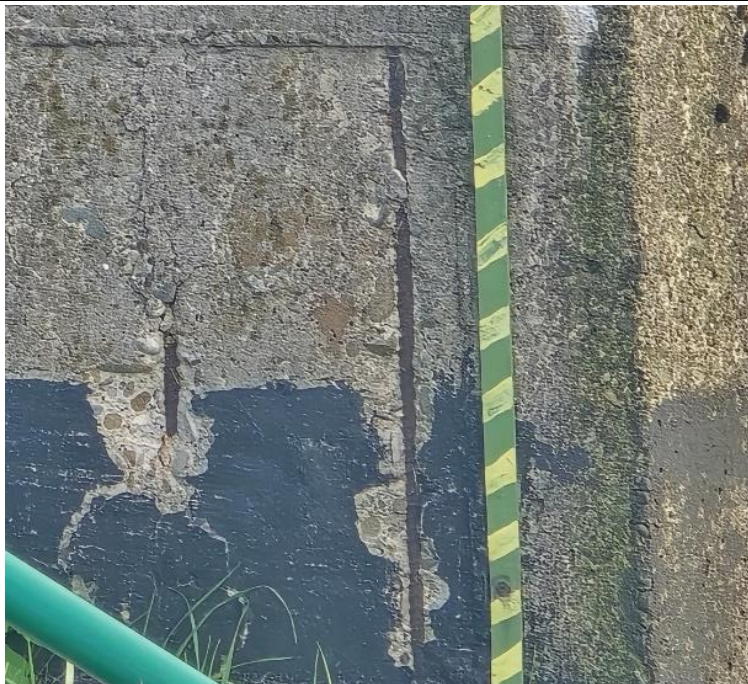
Structure B, culvert, corrosion and visible reinforcement (source: own photo)
